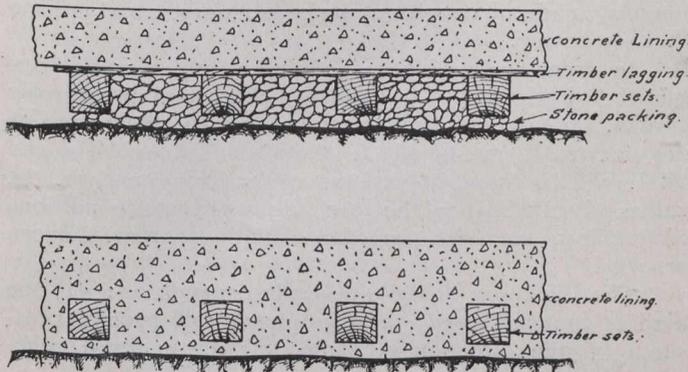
Horizontal Sections Through Side-wall of Tunnel Illustrating Two Different Methods of Construction.
